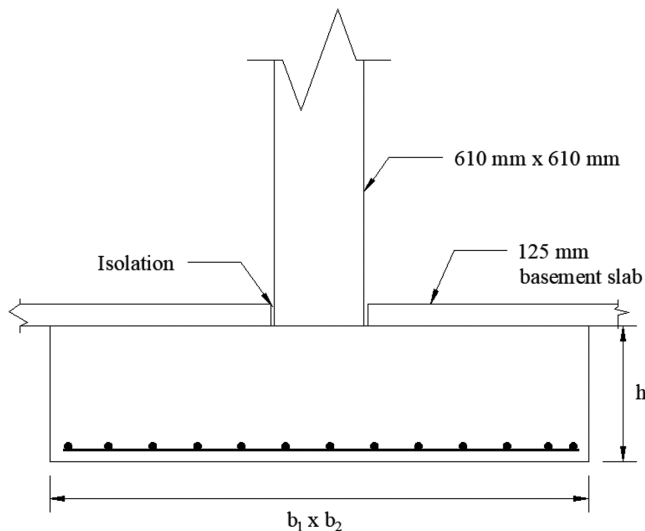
Square footing with square column. (Reproduced from ACI Reinforced Concrete Design Handbook.⁴)
